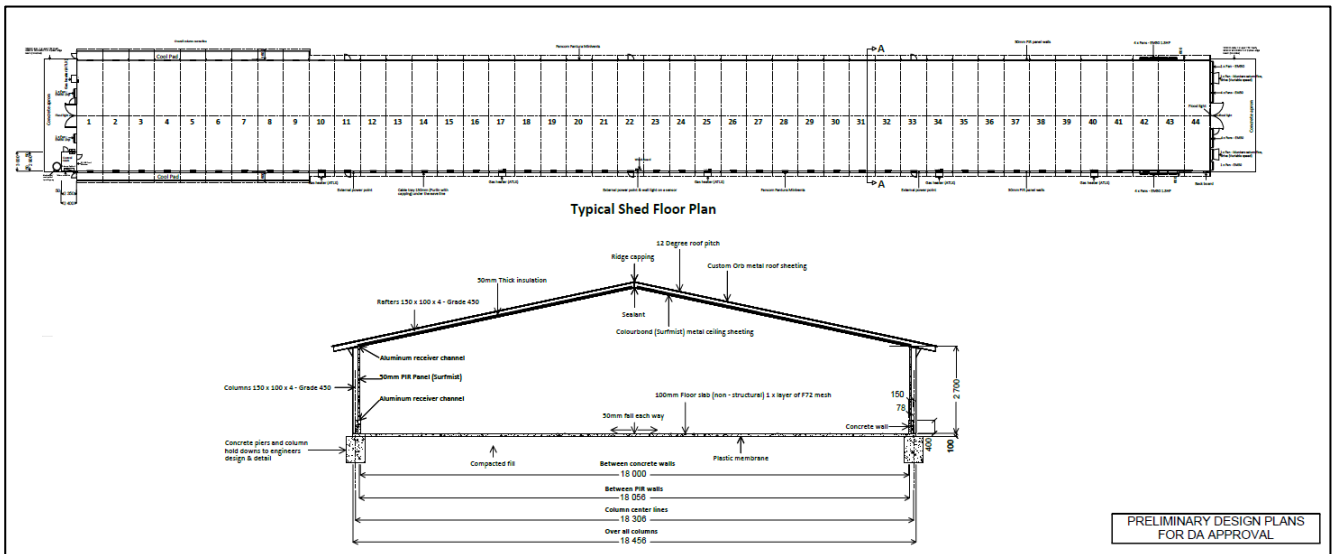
Conceptual Shed Design (Construction Cohort, 2026)
